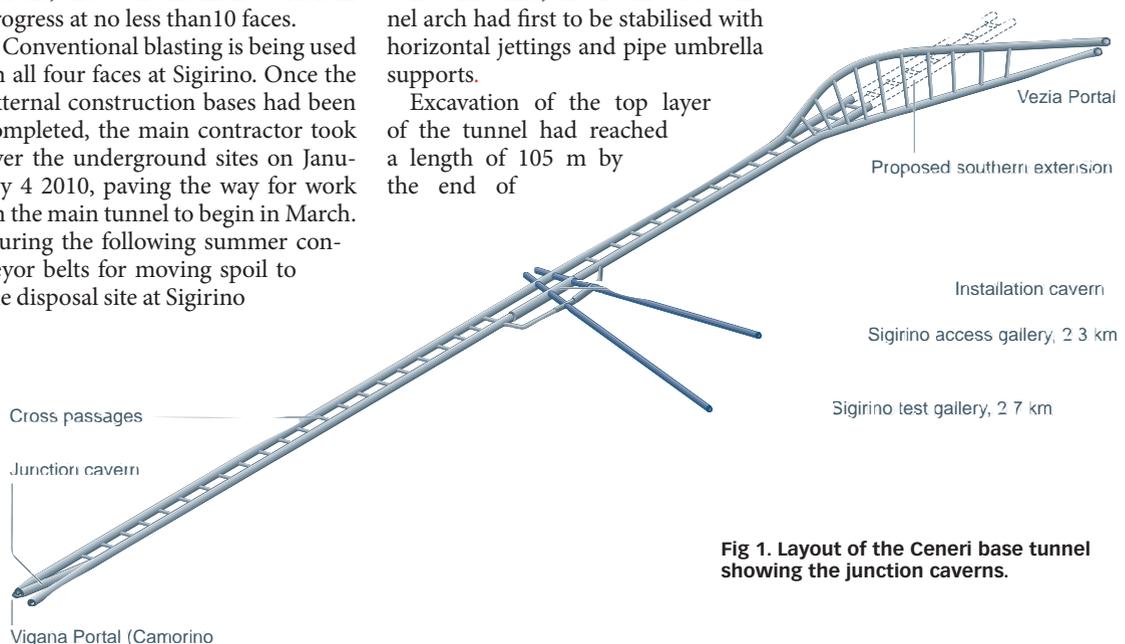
Layout of the Ceneri base tunnel showing the junction caverns.
